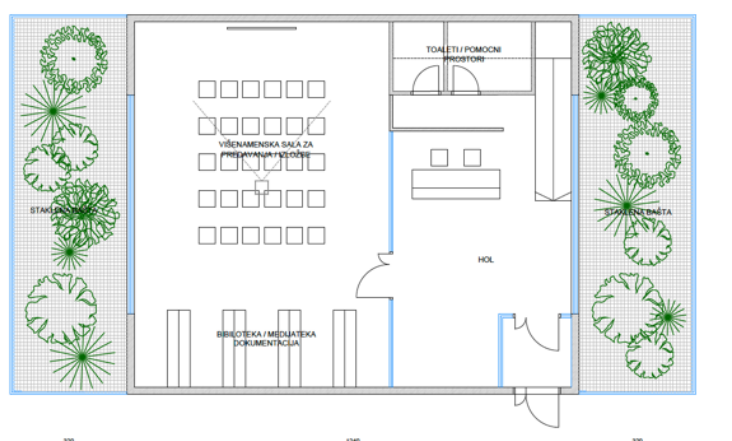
Eco-edu Hub in Park Usce. Ground-floor plan view
